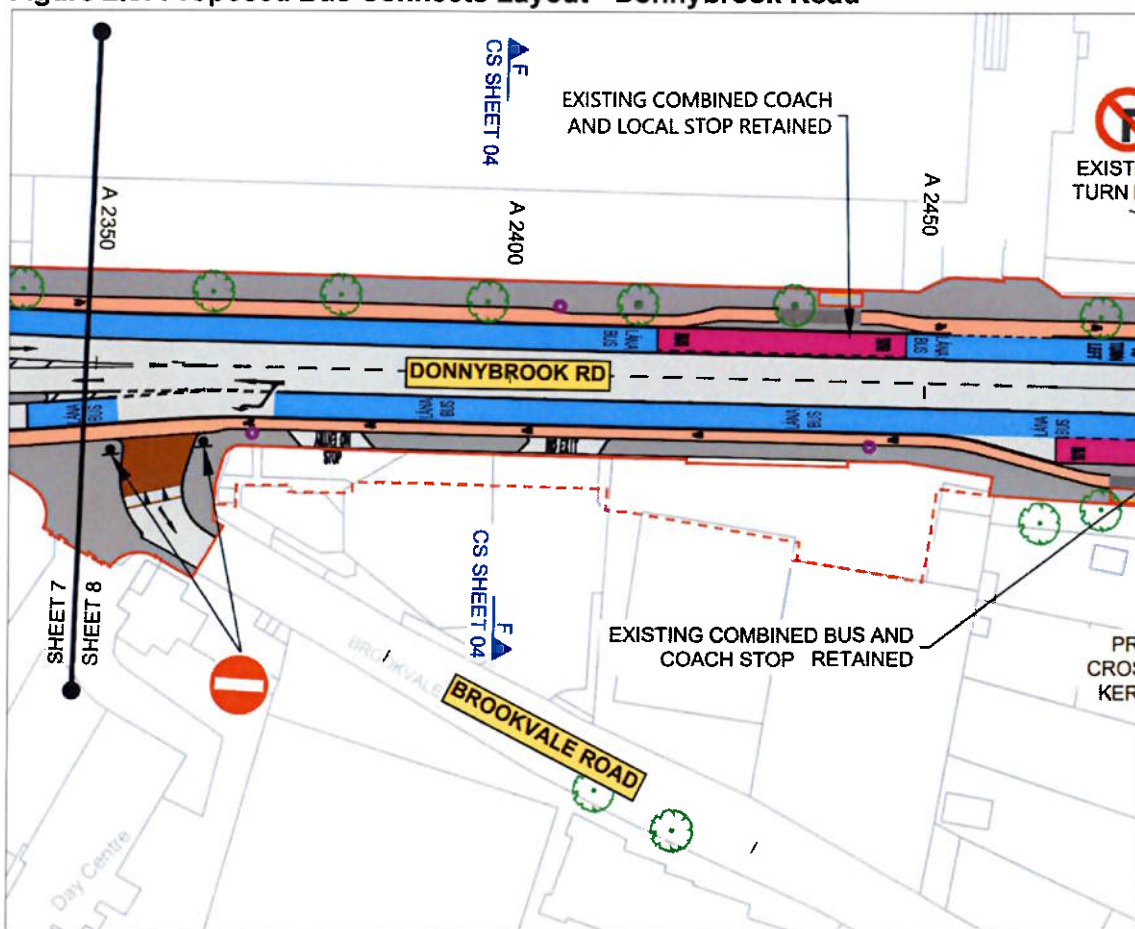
Proposed Bus Connects Layout - Donnybrook Road
